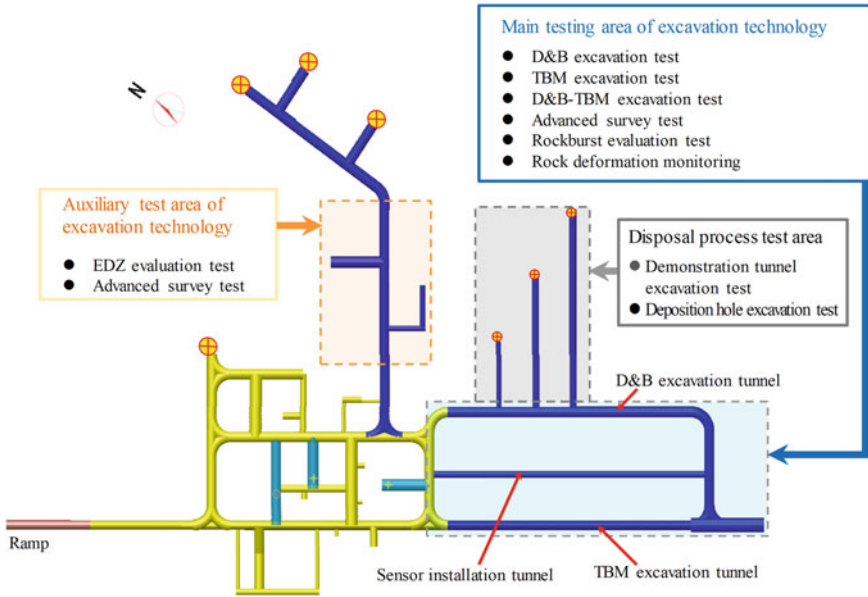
Tests to be performed at -560 m level during construction of Beishan URL
